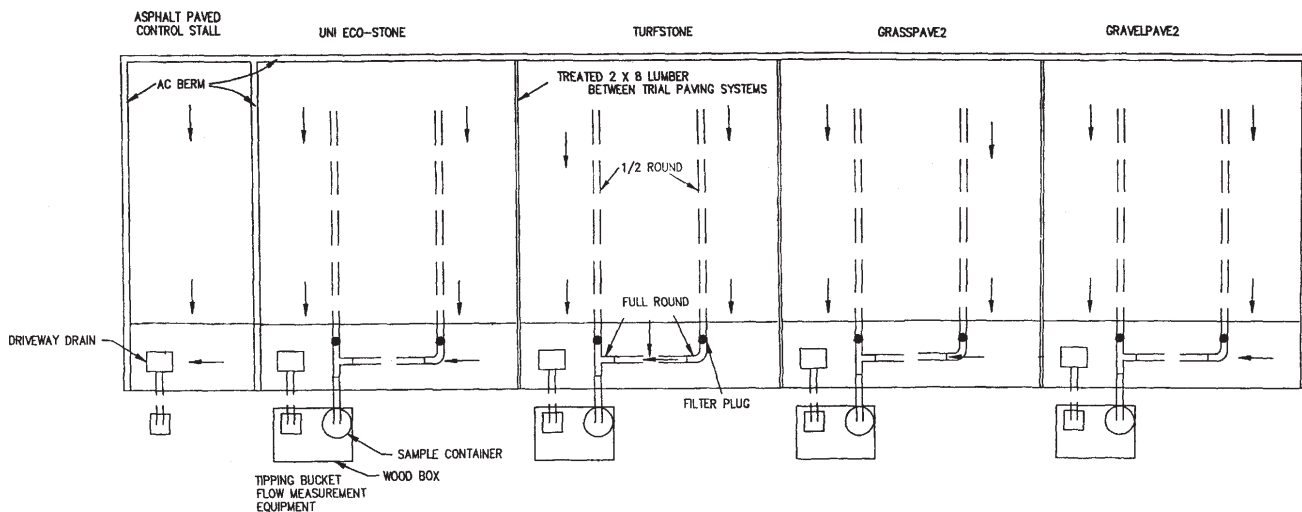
Plan view of the nine test parking stalls. Each permeable pavement type had two parking stalls paired into one instrument station.
